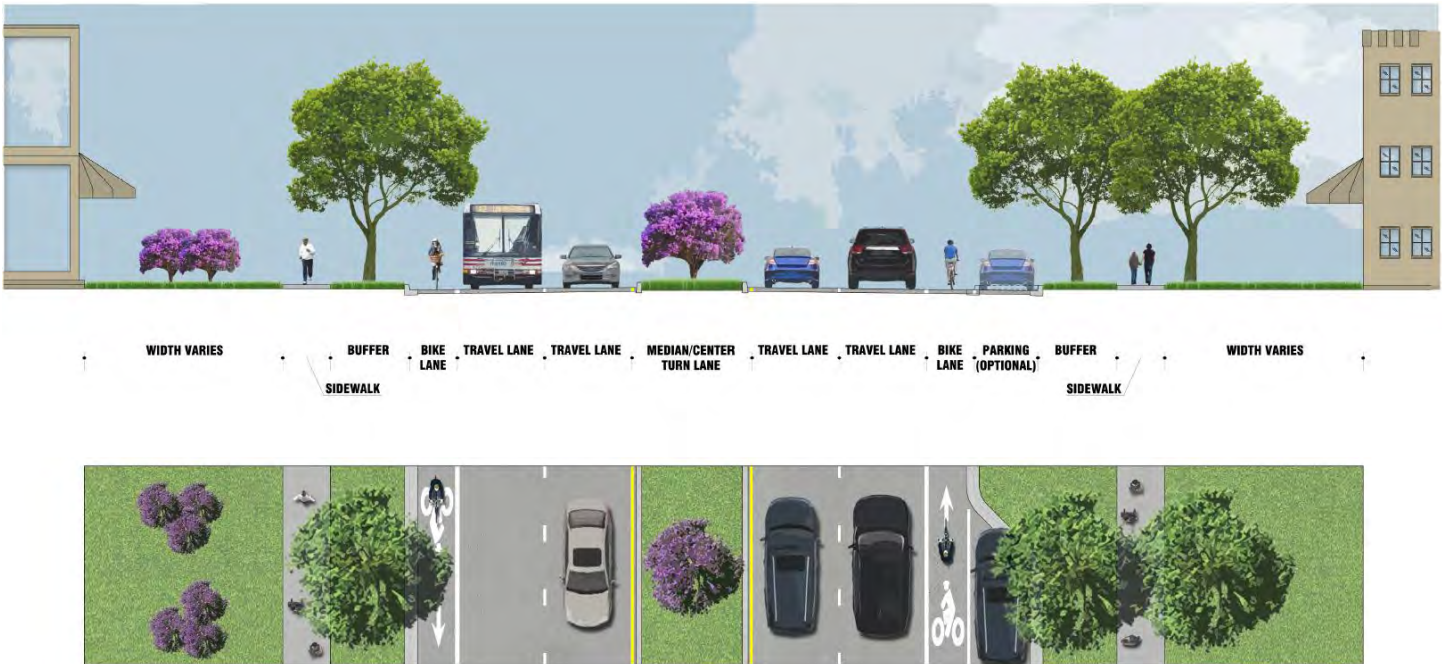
TYPICAL NEIGHBORHOOD BOULEVARD CROSS SECTION
